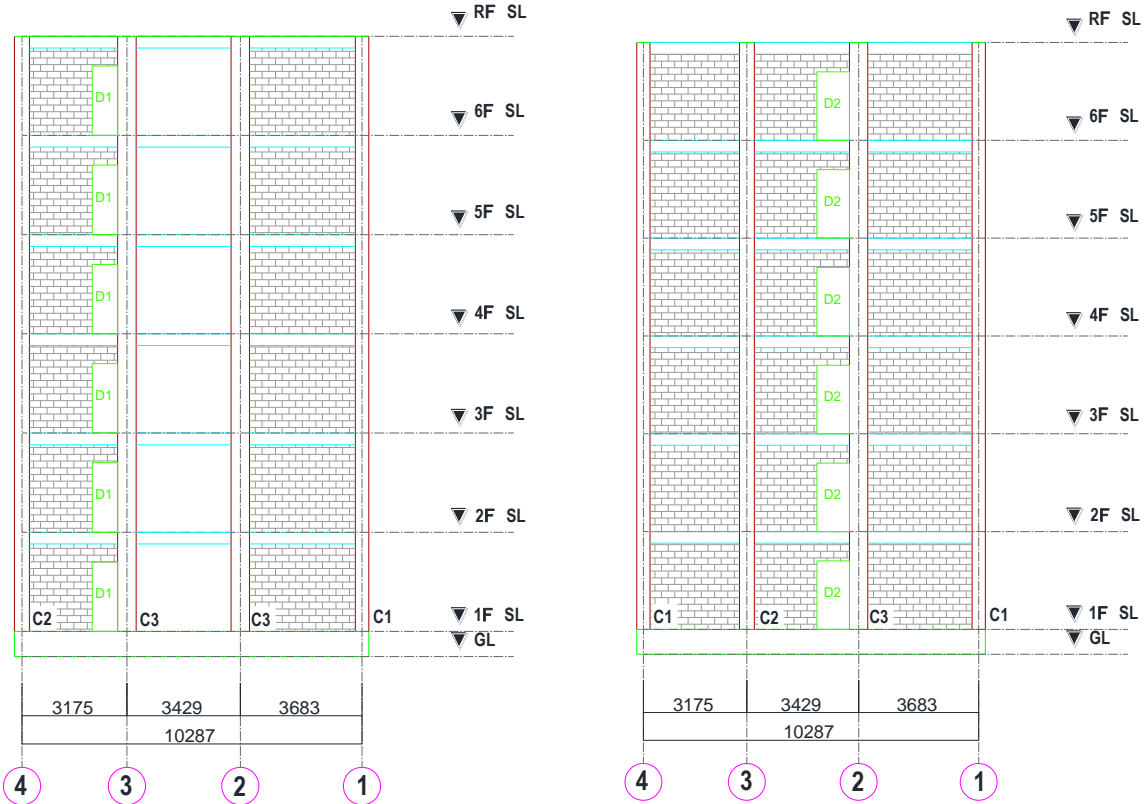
Elevation at Frame C and F, D and E of building no. 3
